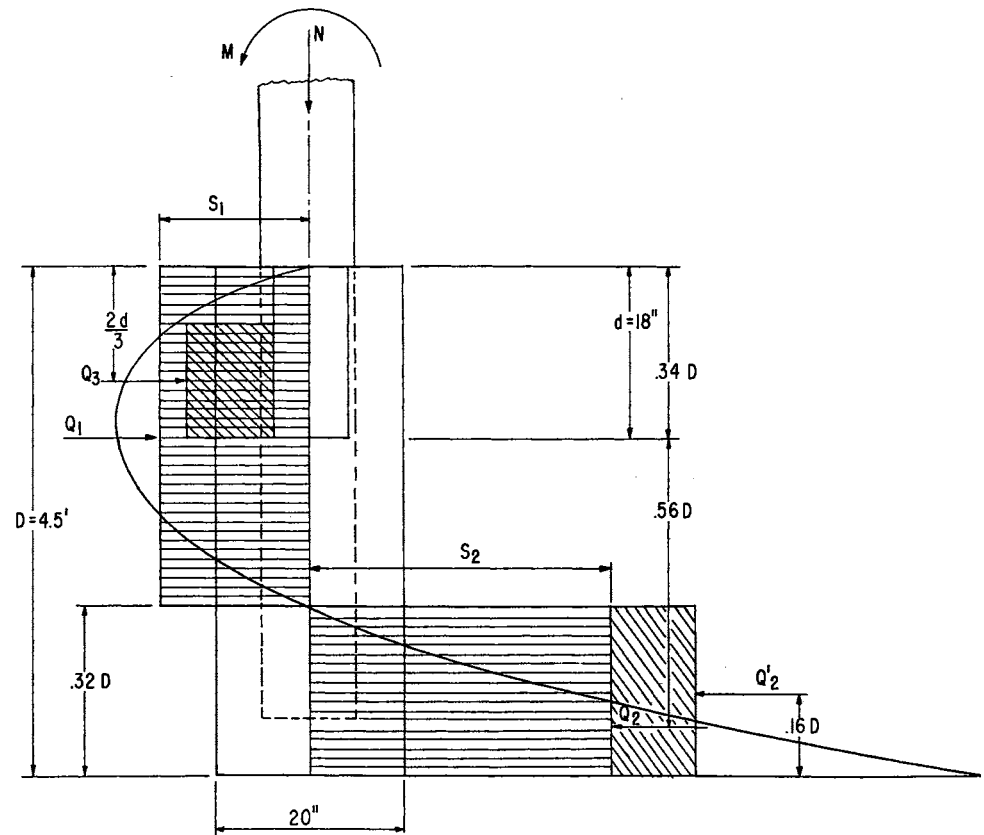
Soil Reactions to Footing and Wing Walls Against Overturning Moments.
